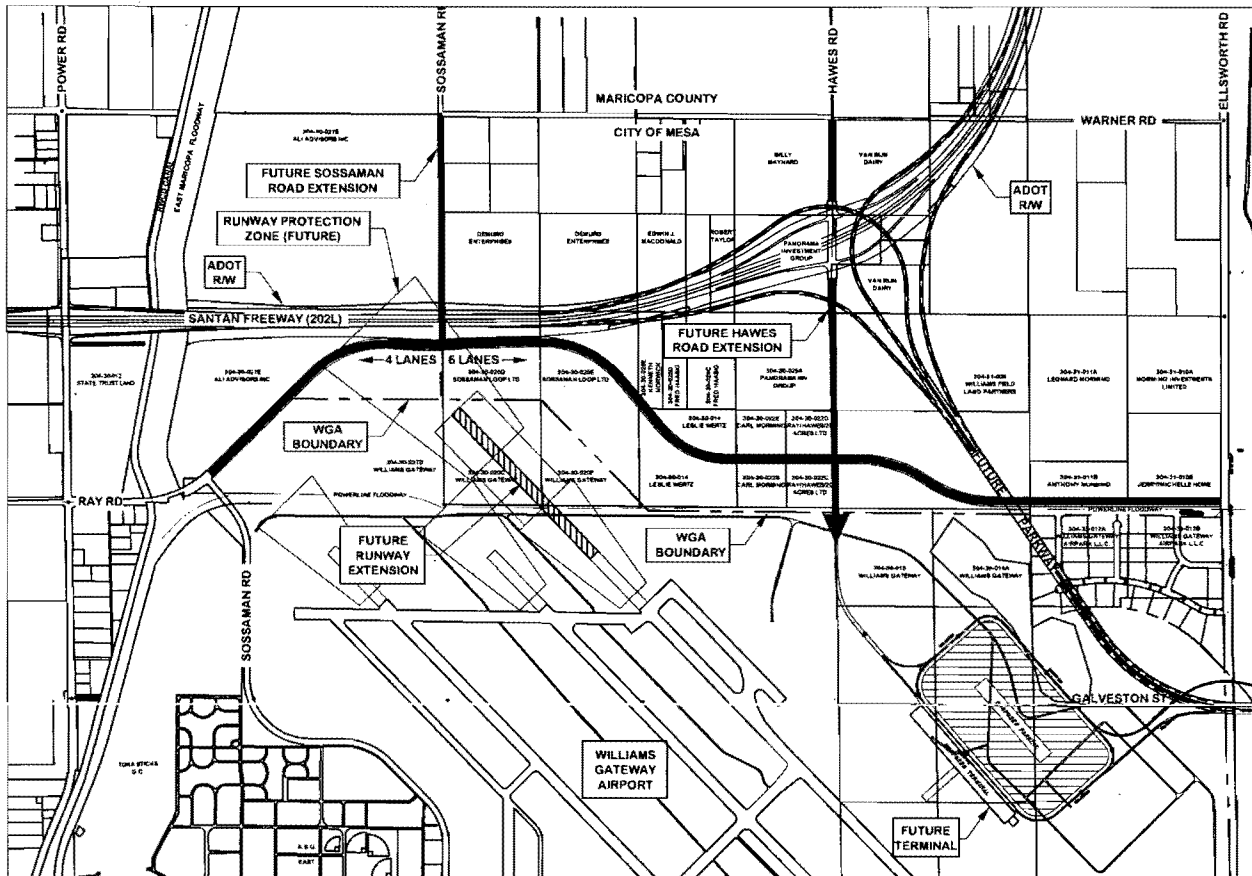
# EXHIBIT "A" - PROPOSED RAY ROAD ALIGNMENT
